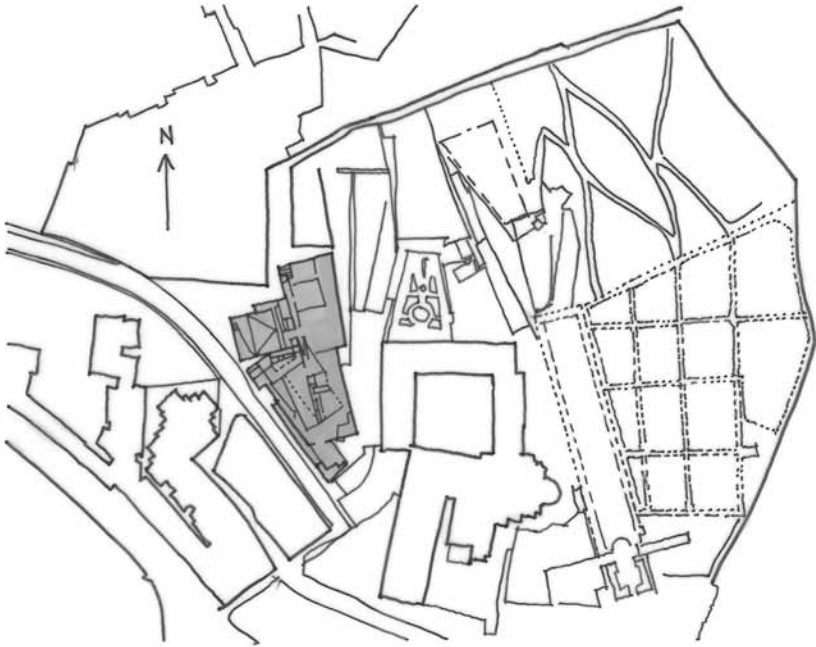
Ground floor plan of the Galician Centre for Contemporary Art in the context of adjacent buildings and convent garden (drawn by author after Siza)
